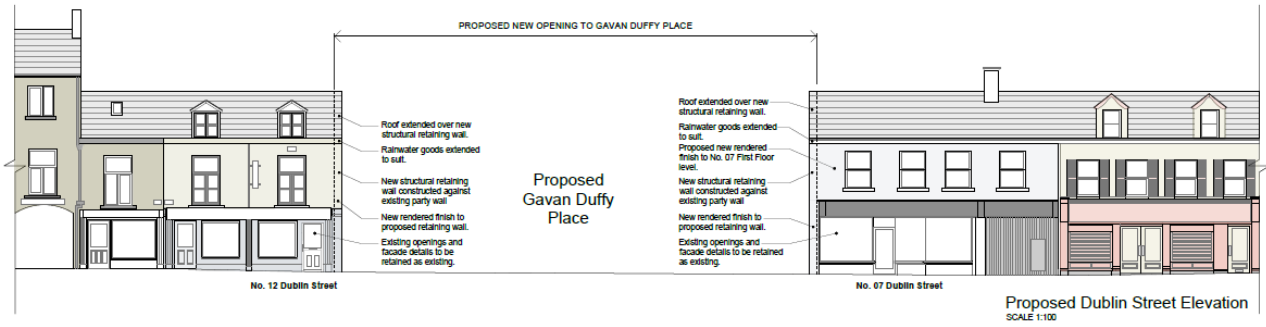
Excerpt from Planning Drawing A-20-001 showing the new opening on Dublin Street
